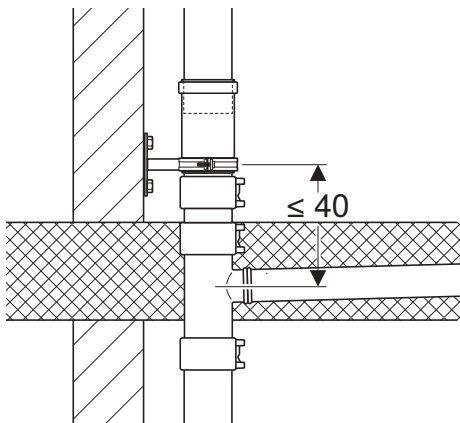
Reduced branch fitting 88.5° , embedded in concrete
